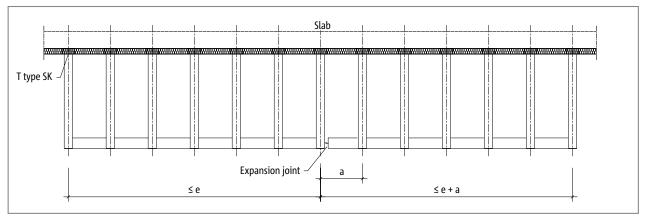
Schöck Isokorb® T type SK: Maximum expansion joint spacing e
